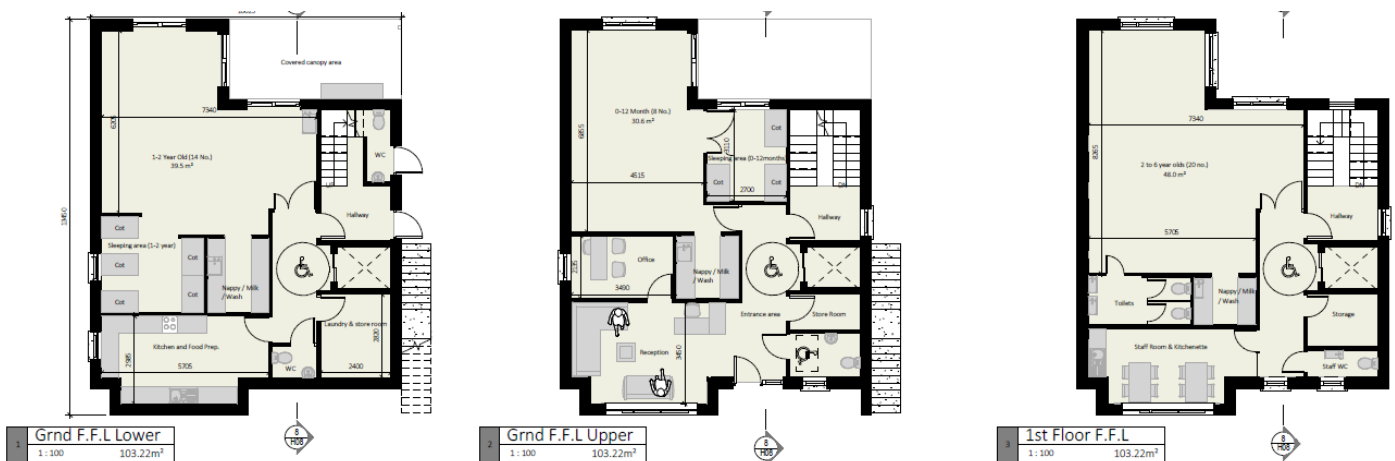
Proposed Floor Plan of the Crèche Facility to be provided as part of this SHD Application
